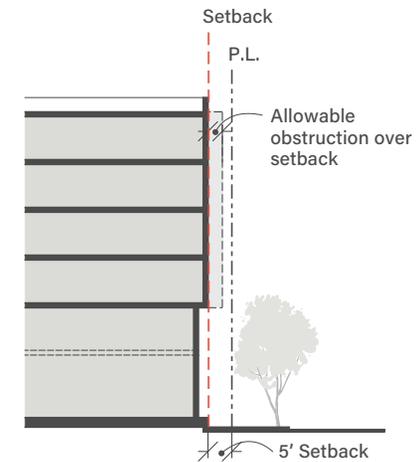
Type B – Typical Streetwall and Park Frontage Setbacks
